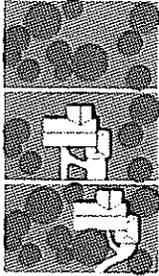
You may be able to save some trees by siting the new construction away from the center of the lot.
